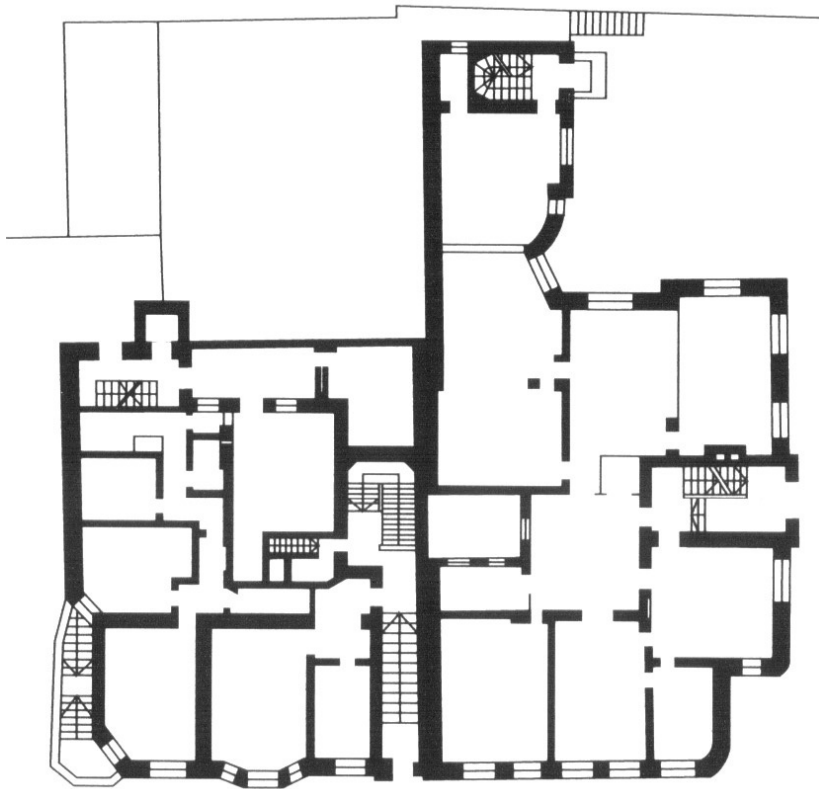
The building on the right: Aleksandras Gordevičius; Jonas Vileišis apartment building, 1930. The building on the left: Edmundas Frykas; Antanas Gavrogkas apartment building, 1932; photo by the author
